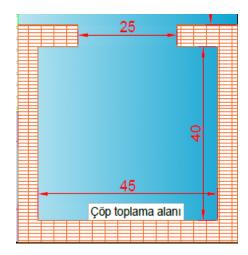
Technical Dimensions of the Platform Top View (centimetre)
